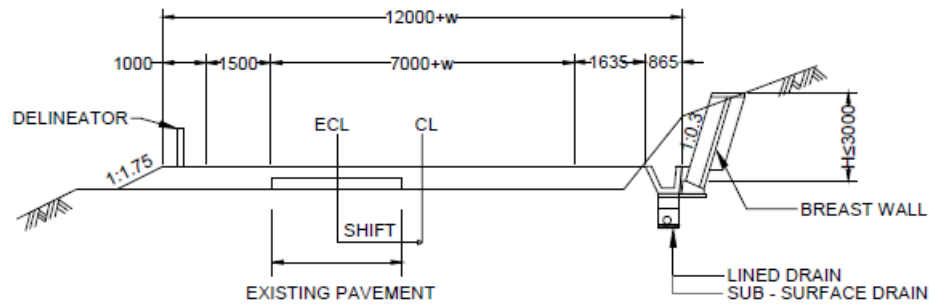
(4): Typical Cross Section – Type 4 (Mountainous and Steep Terrain)
